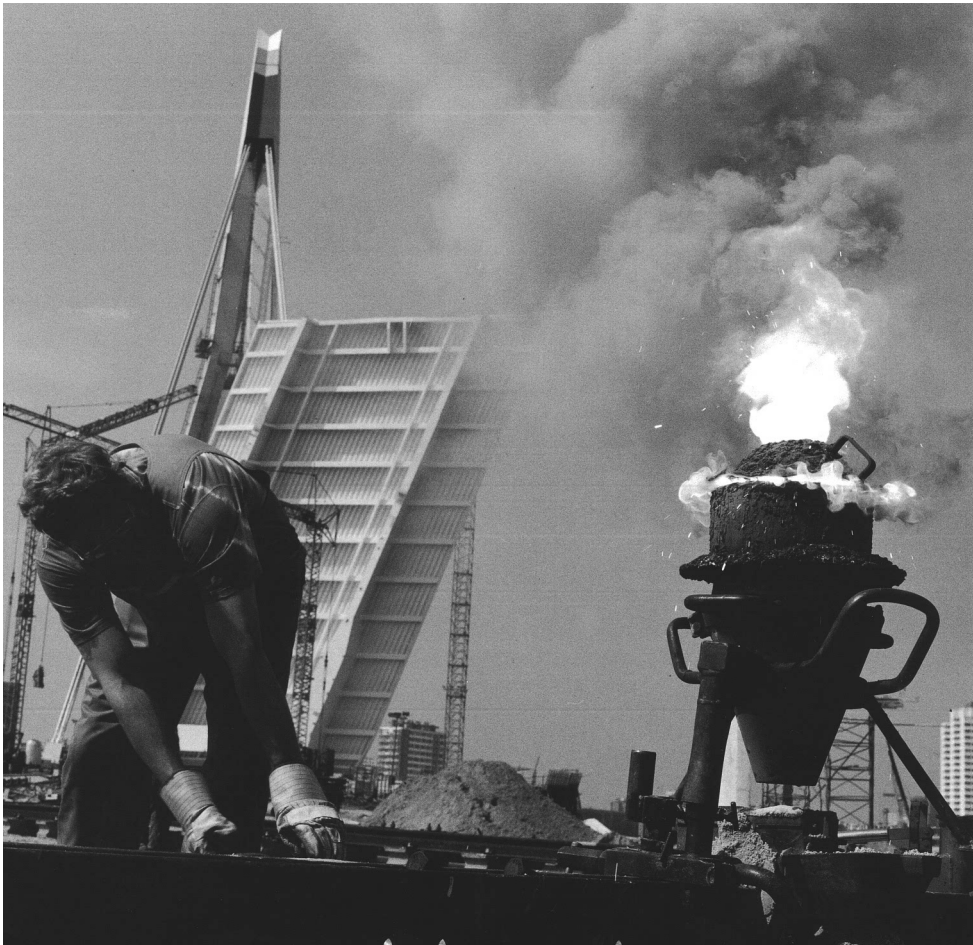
Construction of the Pylon (Oorthuys et al, 1996)
